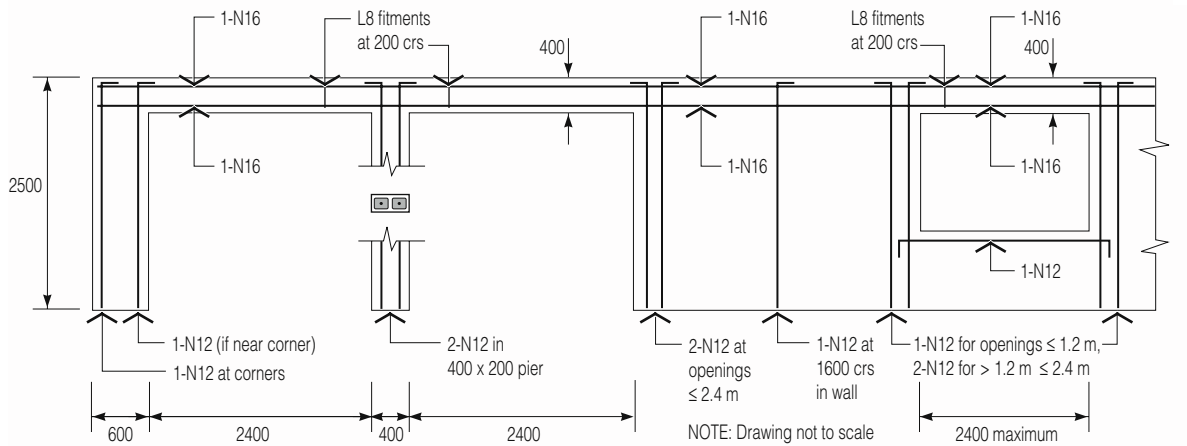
Wall Reinforcement for 190-mm Leaf for Wind Classifications N5 and C2 and 2500-mm Wall Height
